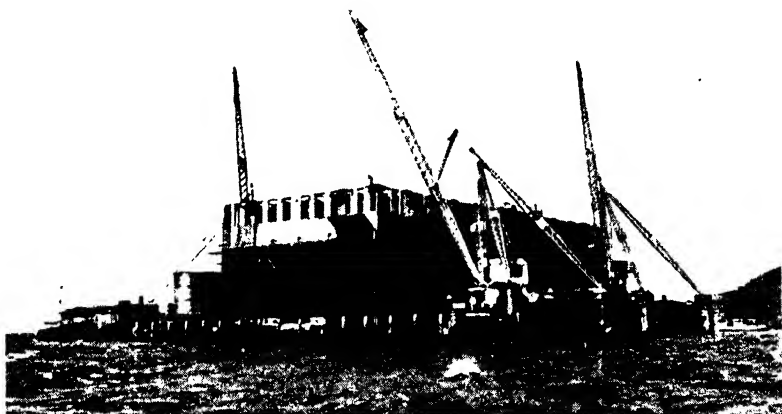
Lowering floating caisson for San Francisco-Oakland Bay bridge pier. Derricks being supported on long piling and gravel-filled steel cylinders.
